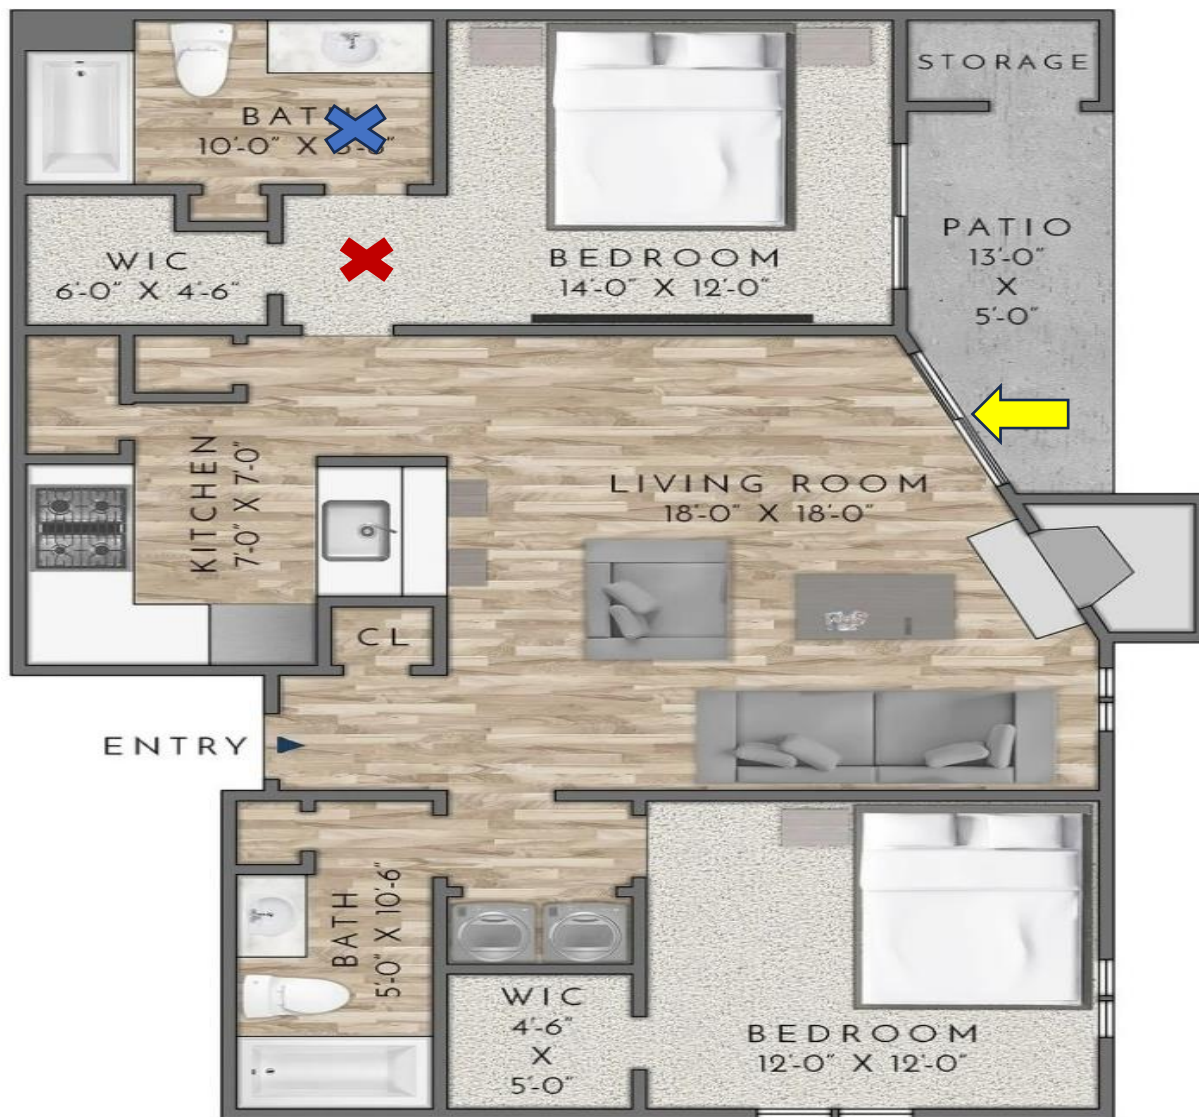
Model floorplan, obtained from the apartment complex's website. This floor plan is identical to the subject residence. The furniture placement in this model floorplan is not consistent with the furniture placement of the subject residence. The yellow arrow points to the sliding glass door and indicates the subject officer's entry point. The blue "X" represents the approximate location of Mr. Jones-Daniel and Mother at the time of the shooting. The red "X" represents the approximate location of the subject officer at the time of the shooting.
